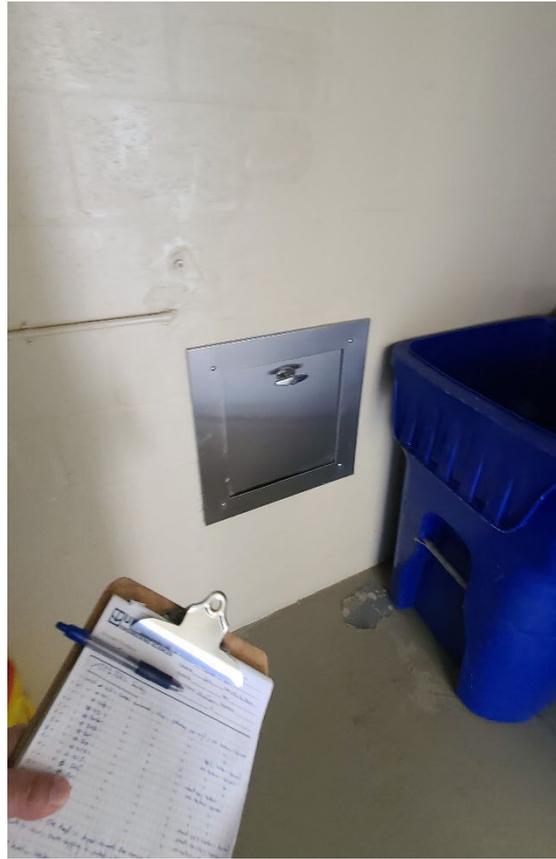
Building Common Area, Dumpster Room at North Stairwell Ground Level, Current Condition.
